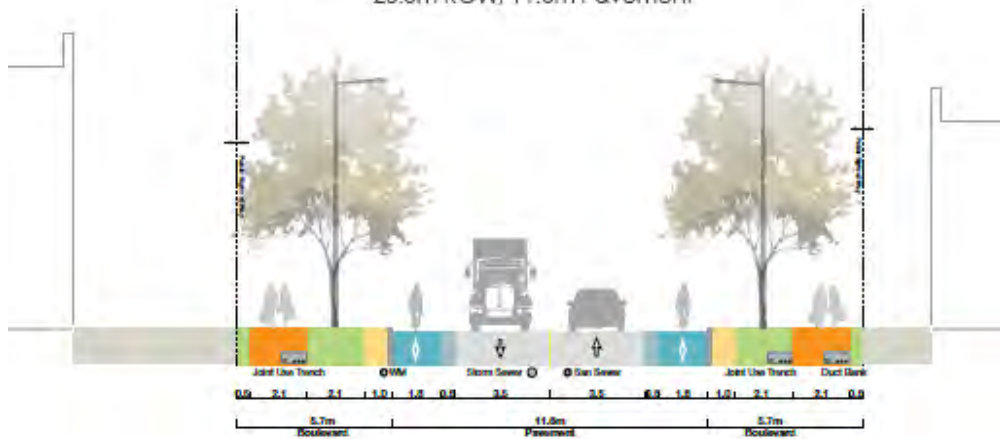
Complete Street - Mixed-Use Neighbourhood Street
